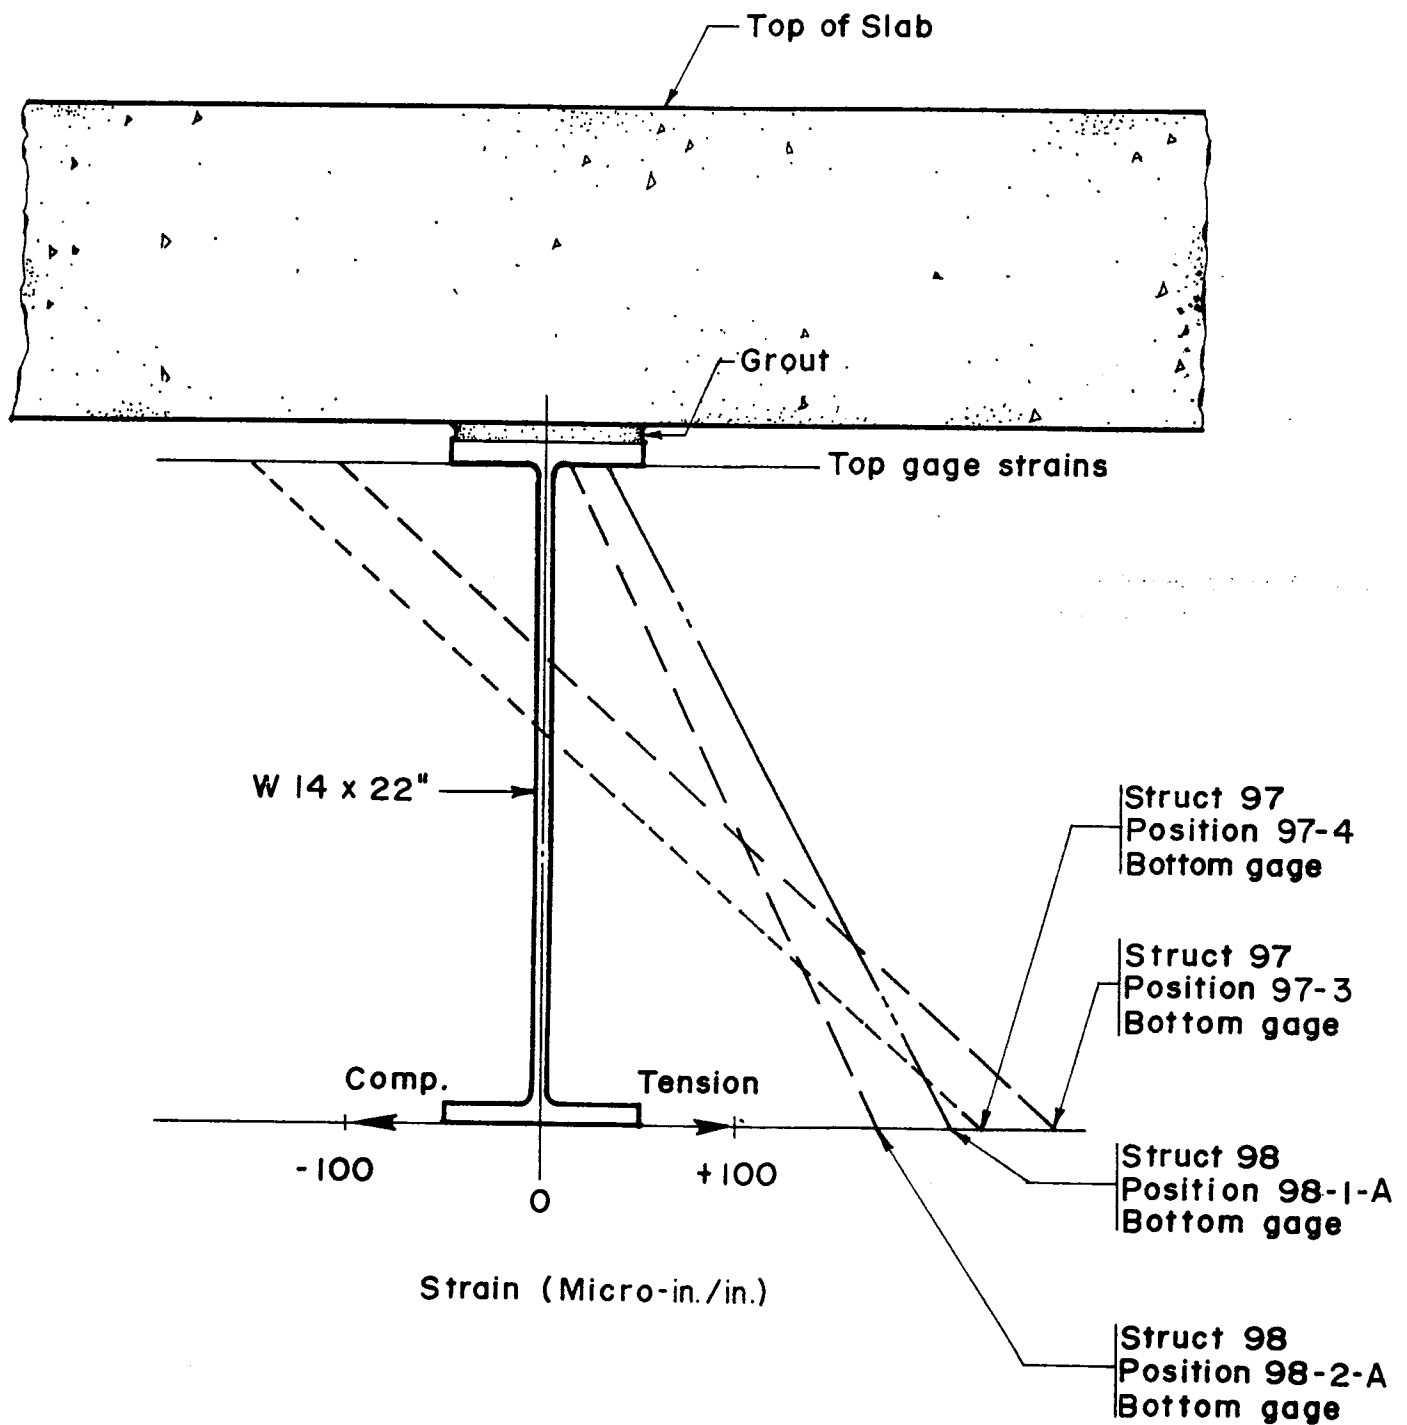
STRAINS IN TRANSVERSE BEAM AT MIDSPAN.
